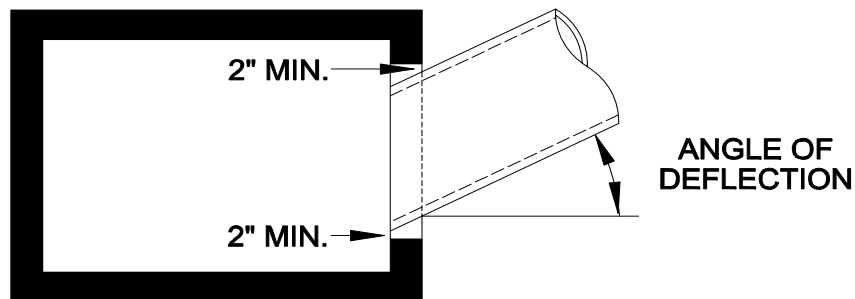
Angle of Deflection of Horizontal Elliptical Concrete Pipes Entering and Exiting Inlet Boxes
